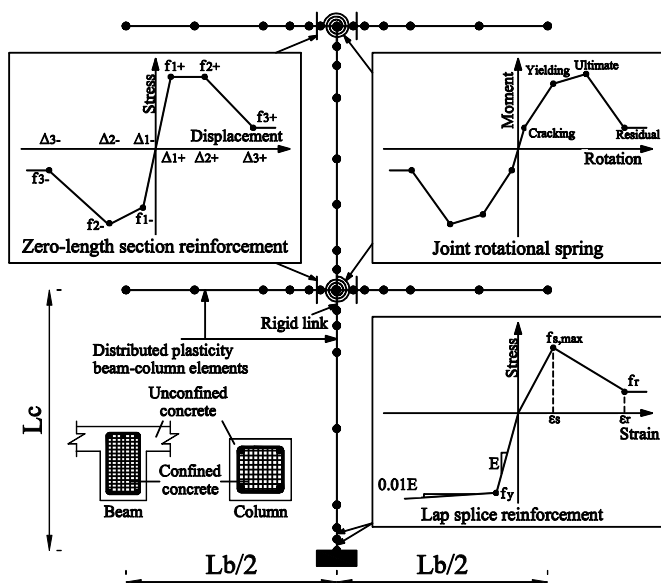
Element discretization around interior column. Material constitutive curves (not to scale) shown for joint rotational spring, lap-splice reinforcement, and zero-length section bottom reinforcement.
